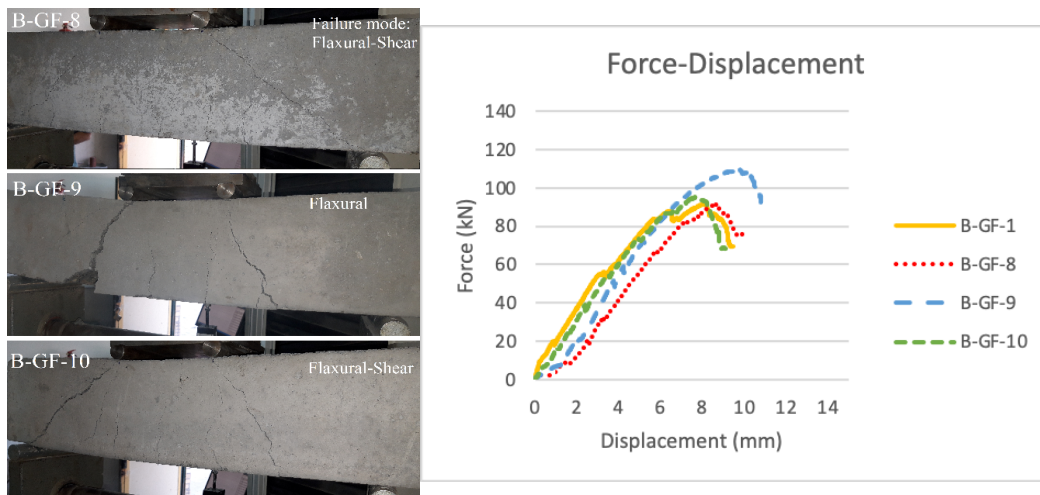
Beams reinforced with GFRP rebars with concrete mixing plans 8, 9, and 10 under bending test.
